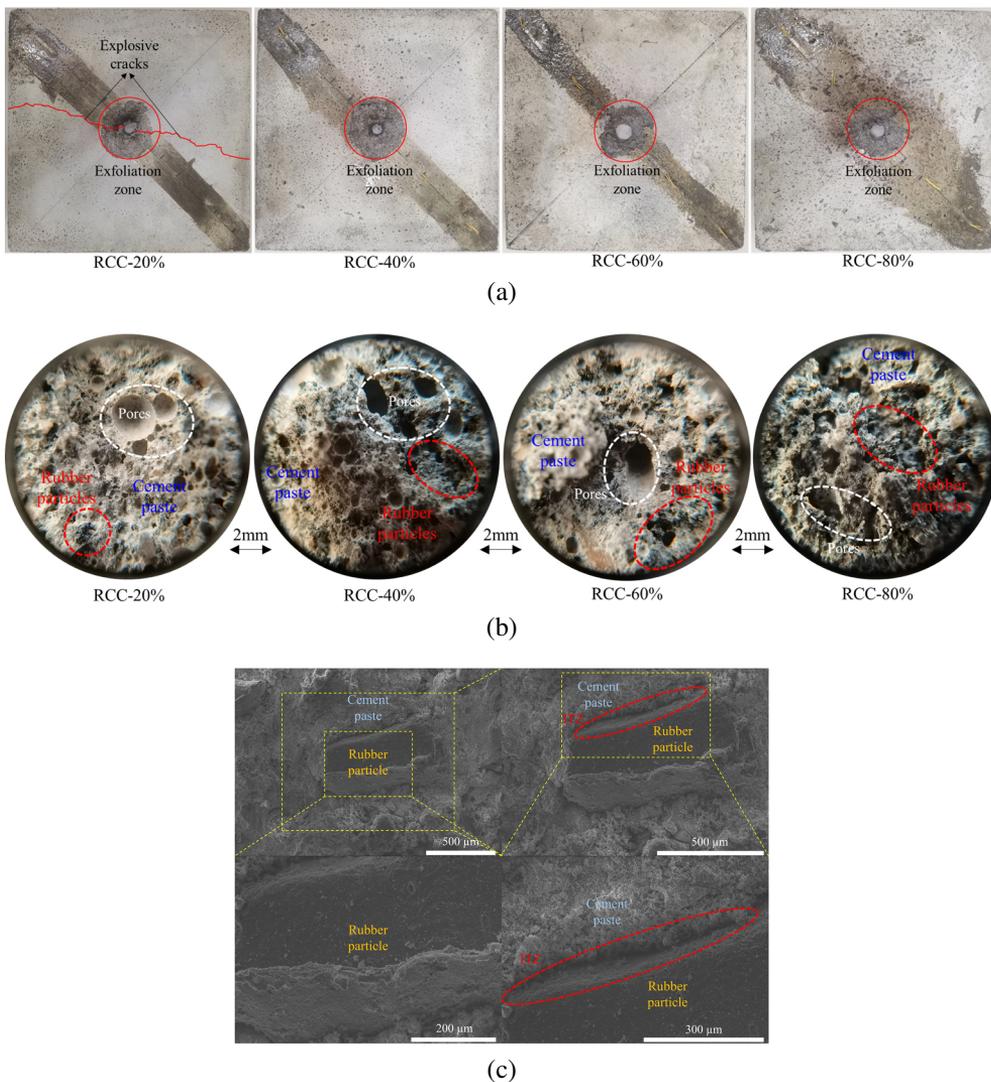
Macro-damage states of explosion in the center of RCC plate specimens and meso-fracture morphology: (a) Macroscopic damage states, (b) Meso-fracture morphology (OM), (c) Meso-fracture morphology (SEM)
